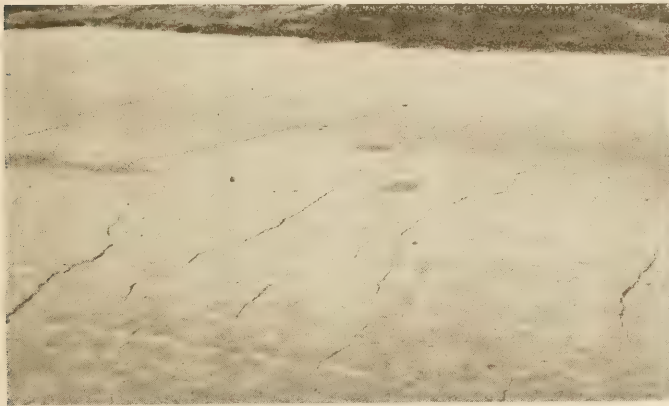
Curved formation of hair cracks which is the typical condition when concrete pavement is laid downhill
